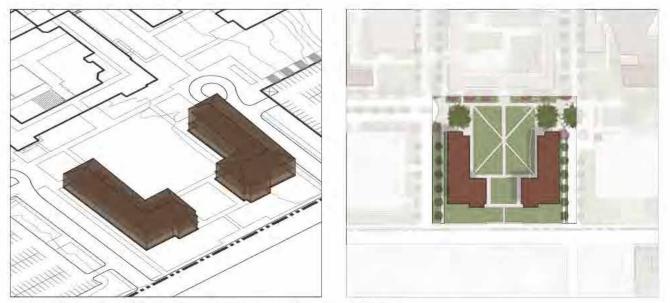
Axonometric and Site Plan of new Student Services and Administration buildings
